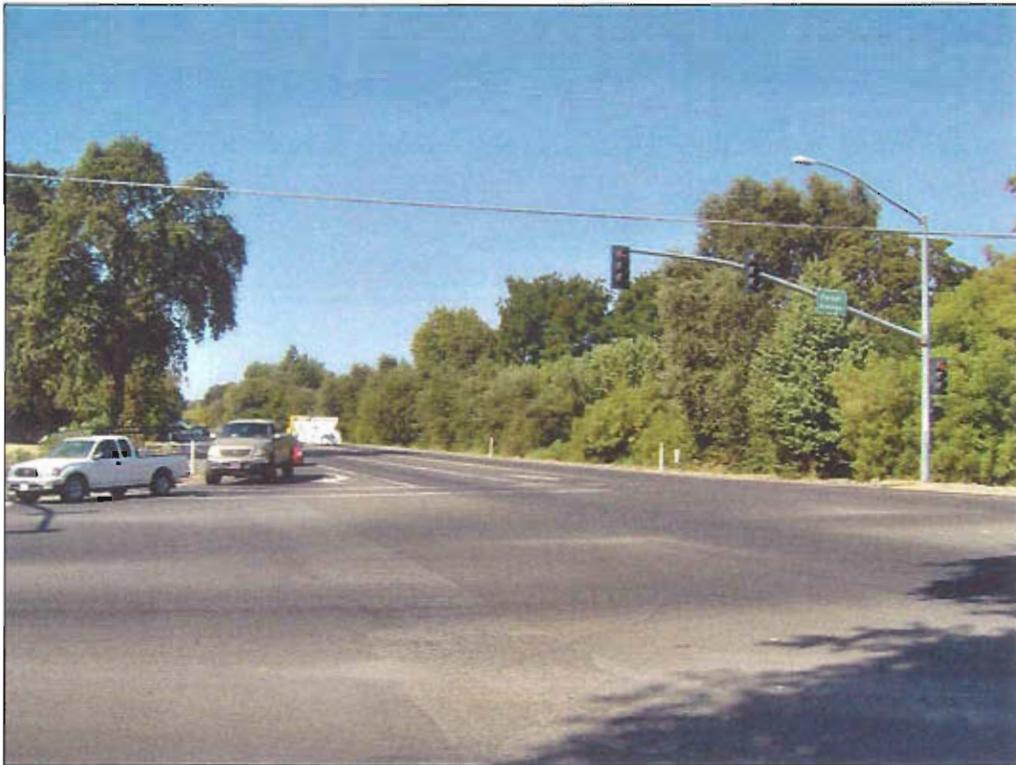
Existing conditions (January 2006) looking west along State Route 32 at the Forest Avenue intersection.
